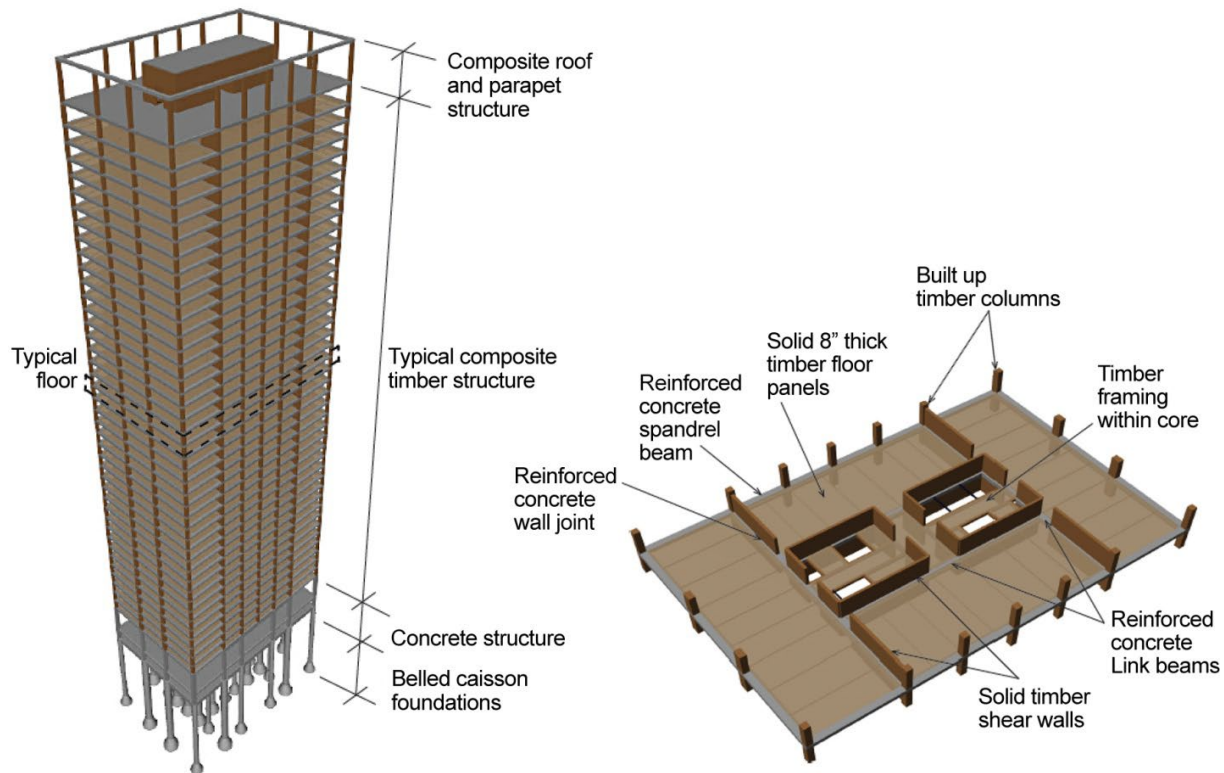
Concrete jointed timber frame (courtesy of SOM).
